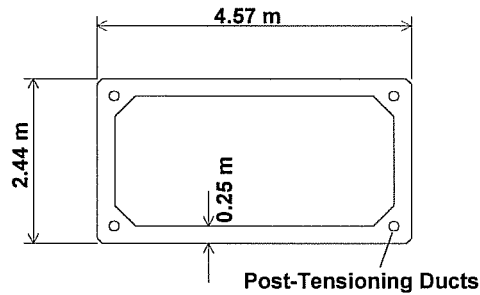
Segmental approach pier cross-section, Neches River Bridge.
